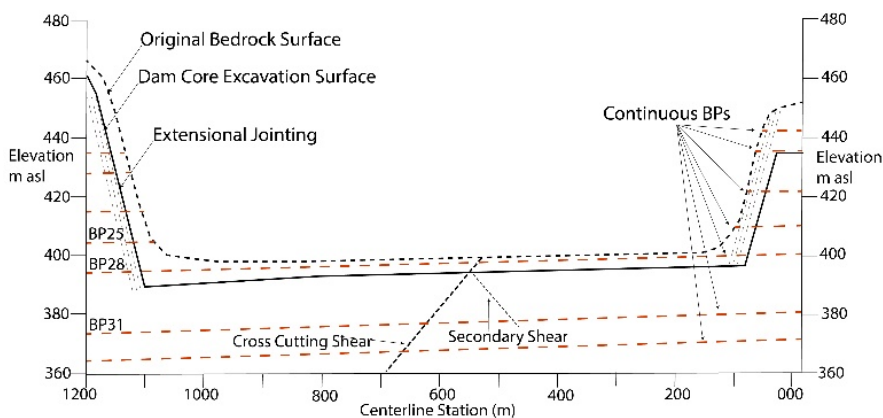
5X vertical exaggeration cross section of main dam excavation, looking downstream
